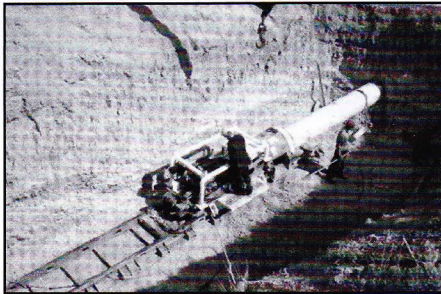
Example of Auger Boring. Photo courtesy of BarbcO, Inc.
